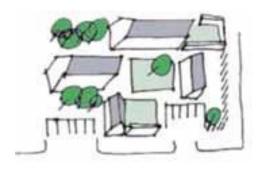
Example of potential streetscape layout. Gardens, shared space and housing are of higher visual prominence than roads and car-parking.
